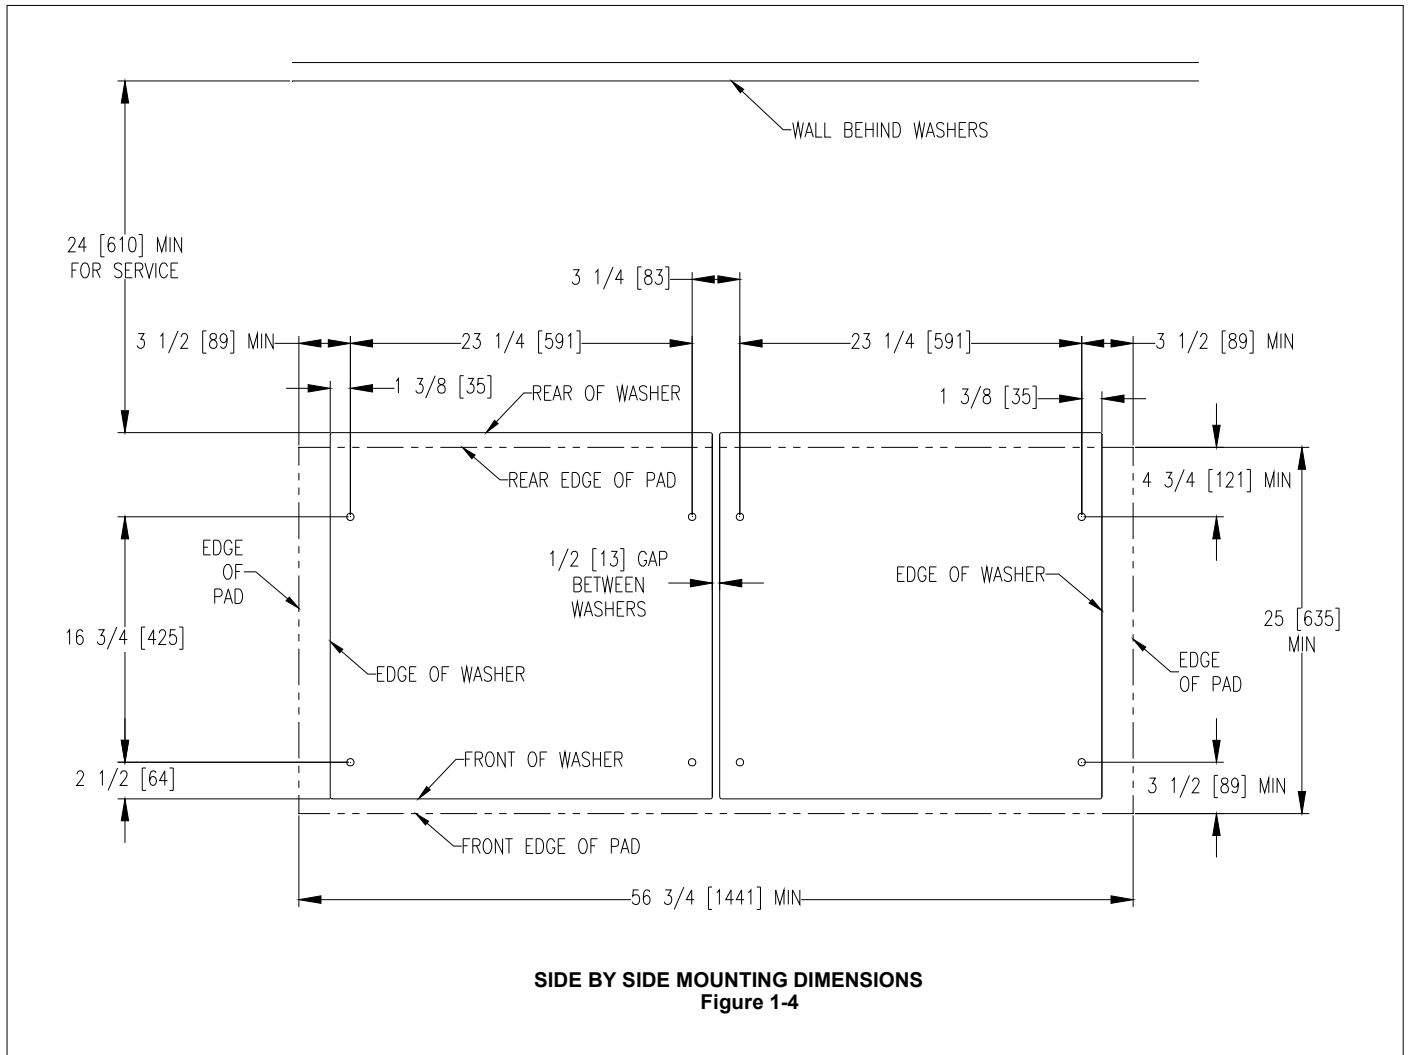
T-300 Machine Side by Side Mounting Detail
